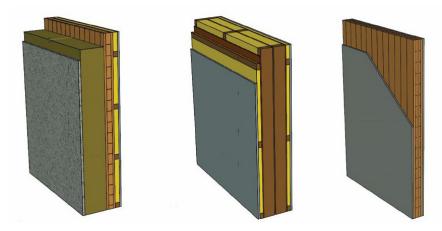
c - Wall details (from left to right): outer wall with plastered façade; separation wall (cavity wall), inner wall
